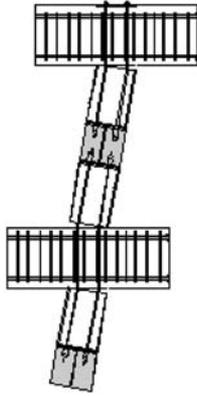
Schematic deformed configuration of unbonded PT precast column.
